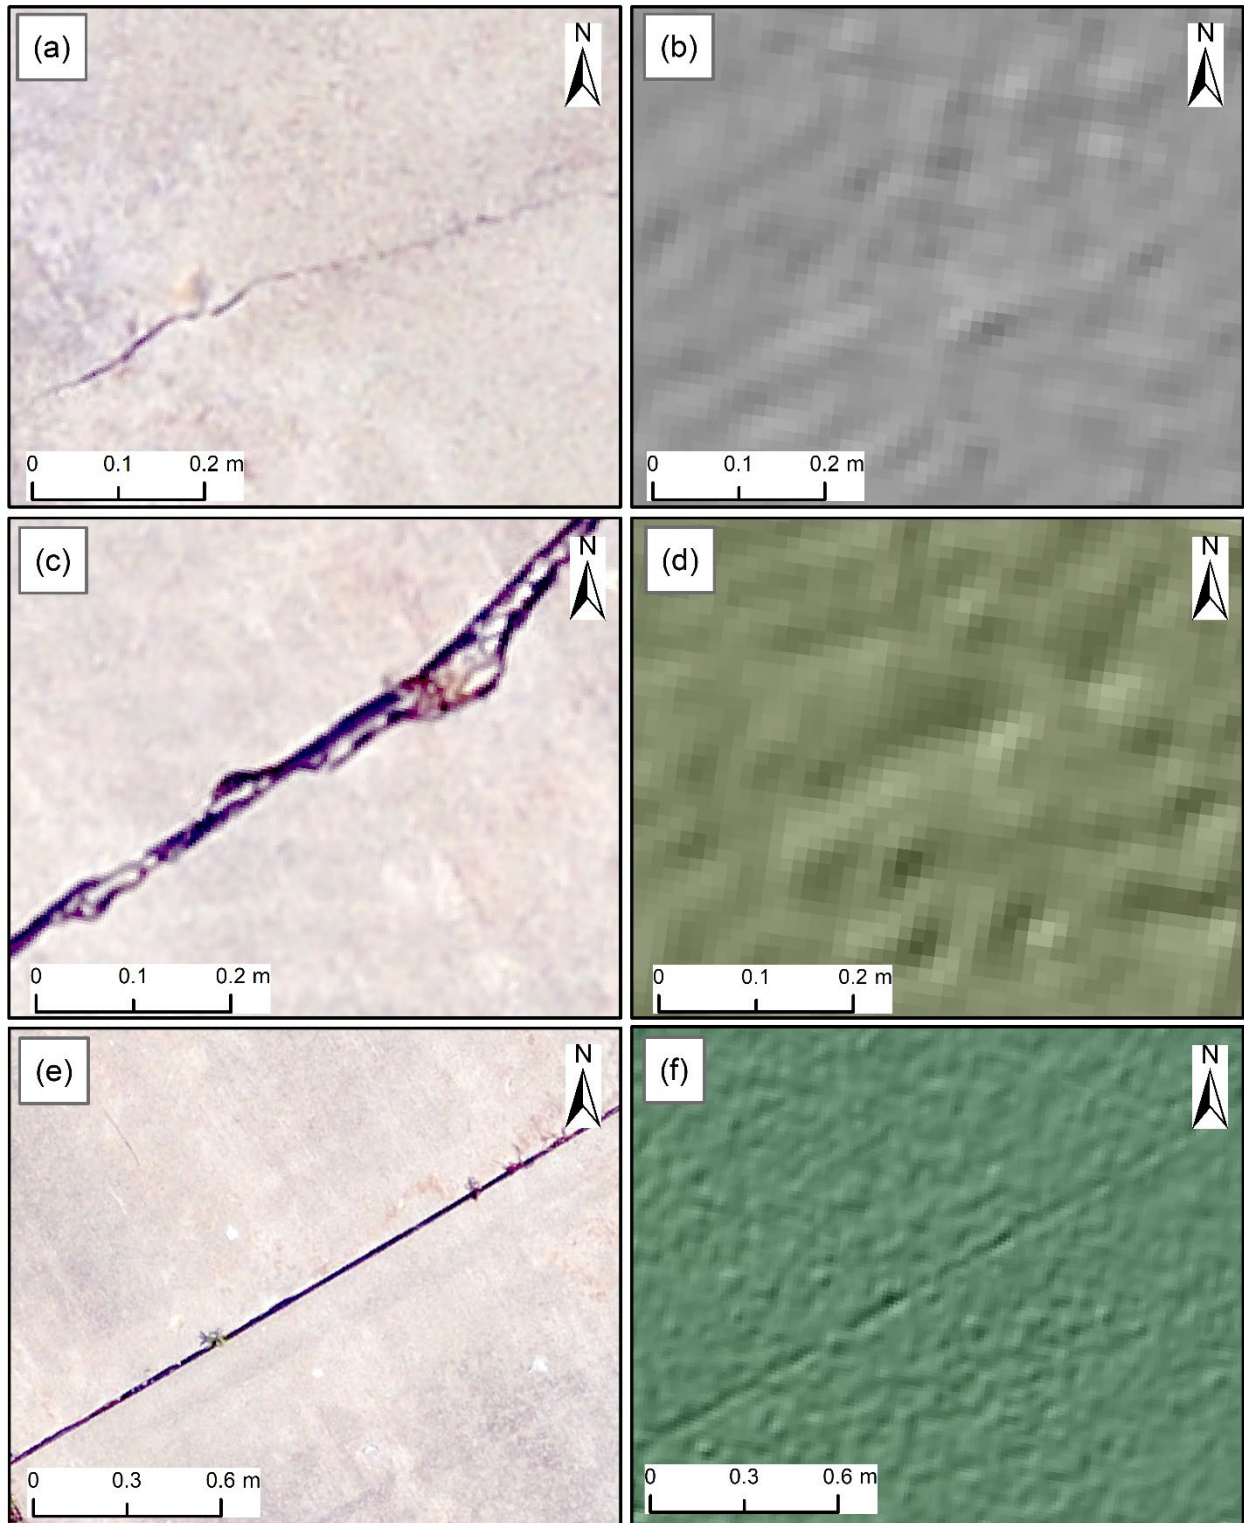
Longitudinal, Transverse, and Diagonal Cracks (L) in (a) 3.2-mm/pix Orthophoto and (b) 12.9-mm/pix DEM; LTD Cracks (M) in (c) 3.2-mm/pix Orthophoto and (d) 12.9-mm/pix DEM; and Joint Seal Damage (H) in (e) 3.2-mm/pix Orthophoto and (f) 12.9-mm/pix DEM
